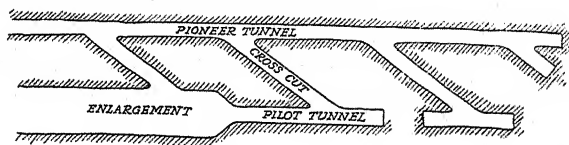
Driving large-size tunnel with pioneer and pilot tunnels
